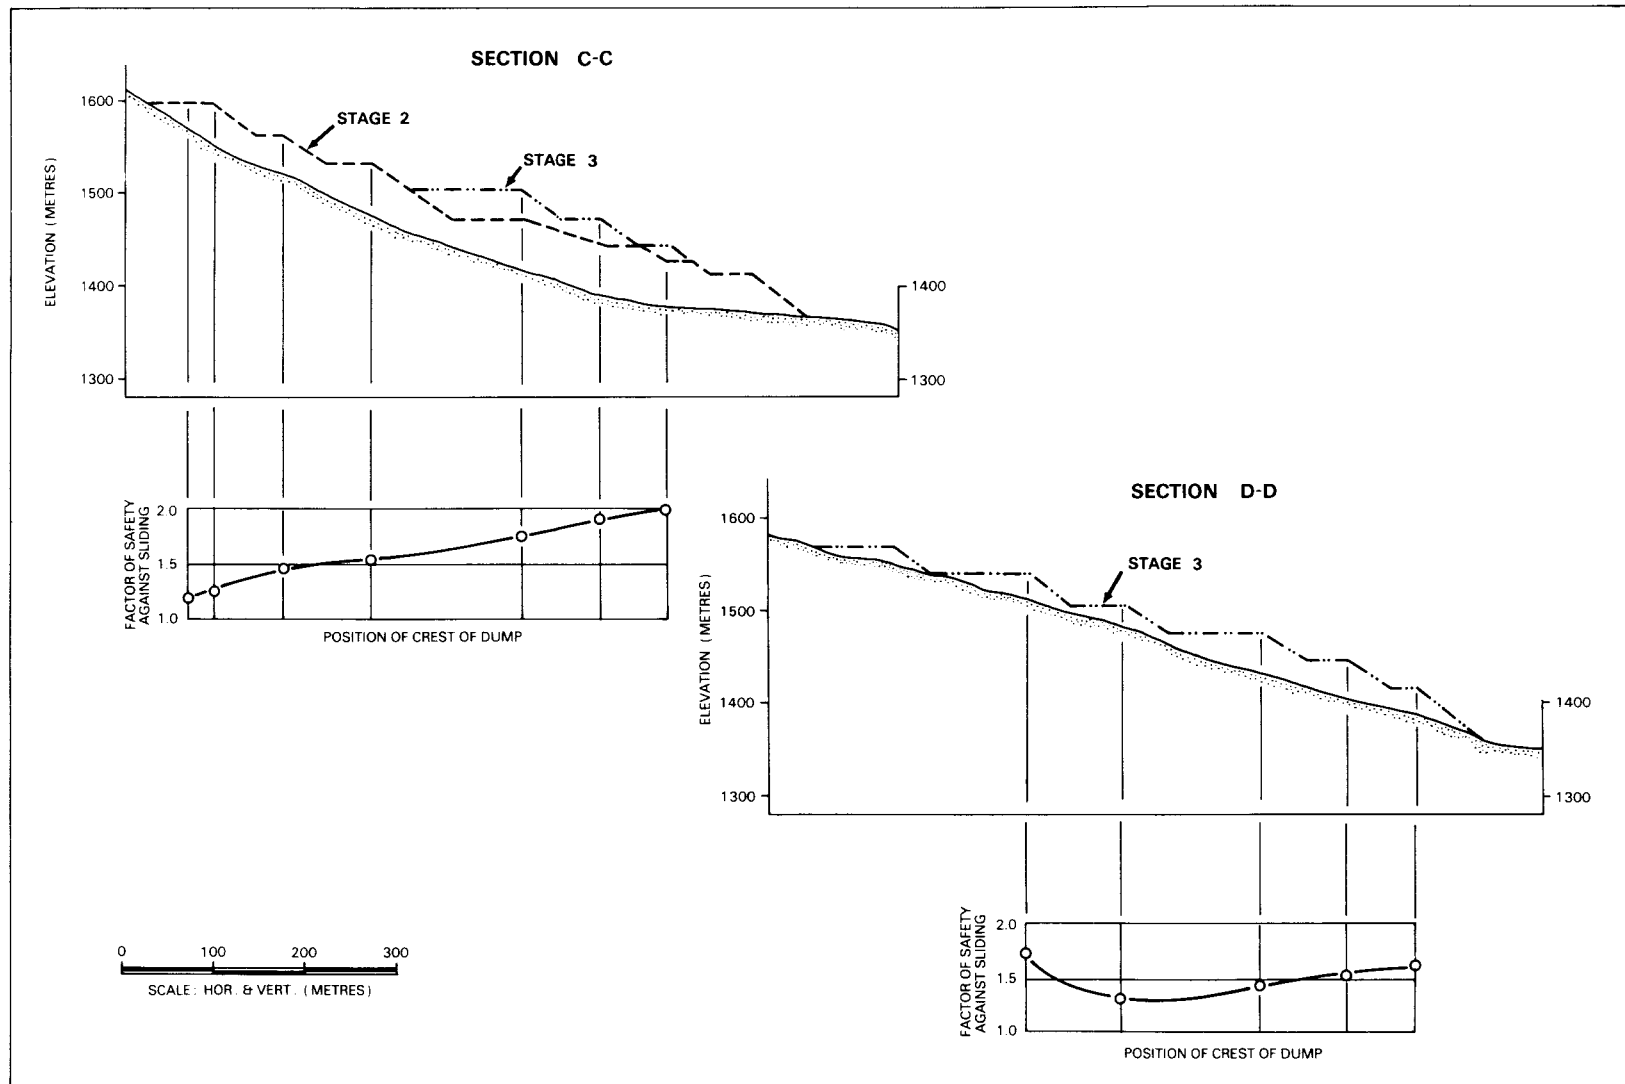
Cross-section profile of North Hill Waste Dump C (see Figure 15). Stage refers to stage of the mine plan for the North Hill (see Subsection 2.1). (From Golder Associates 1981.)
